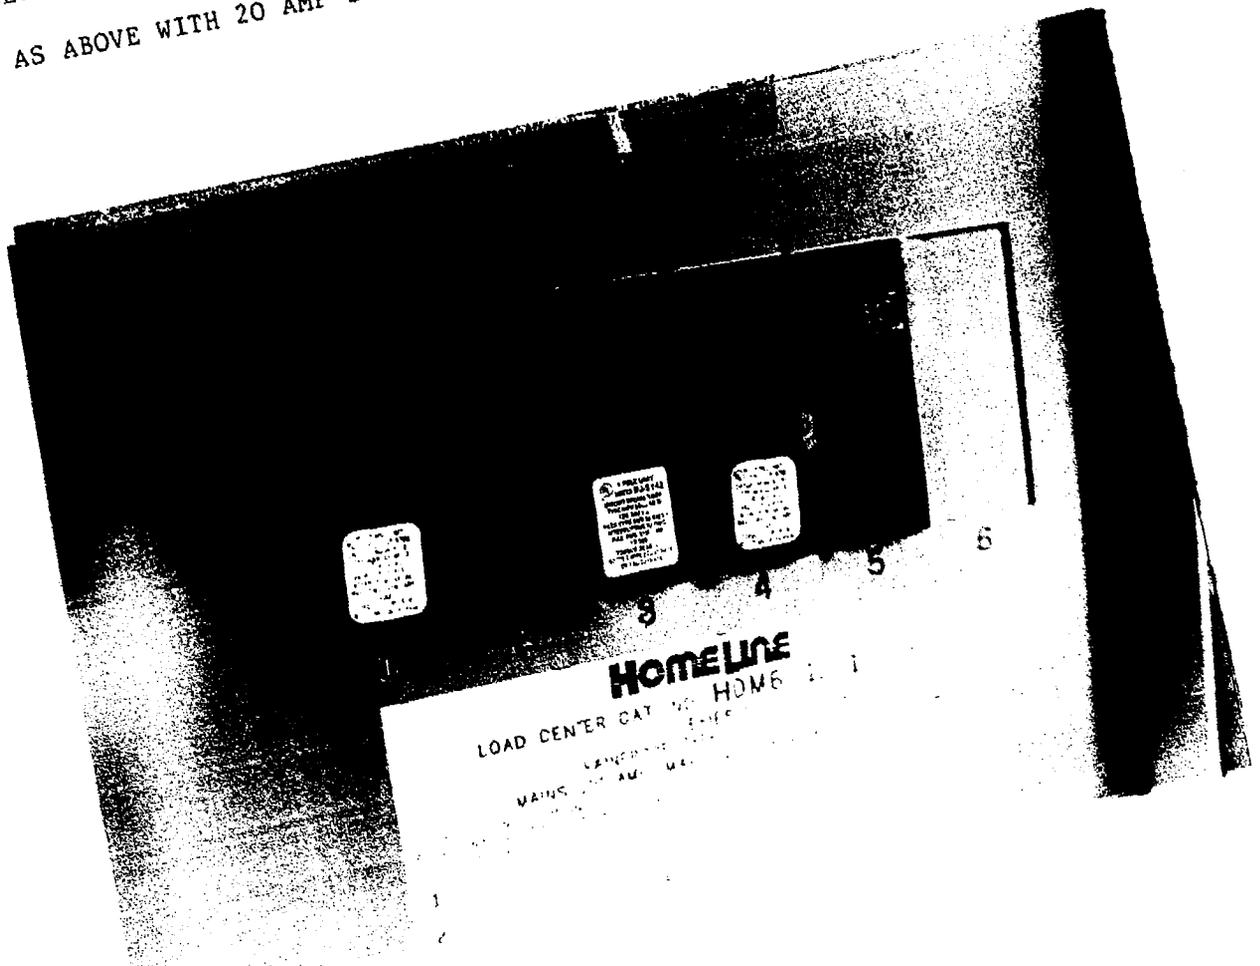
ELECTRICAL LOAD CENTER AS DEPICTED IN PHOTO 5
